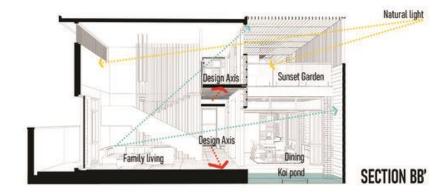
Water element of Kerala Residence (Archdaily, 2020)
